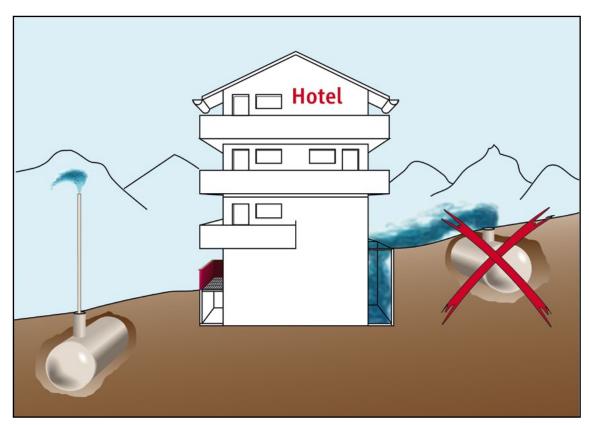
Arrangement of the compressed gas tanks and their blow-off lines
